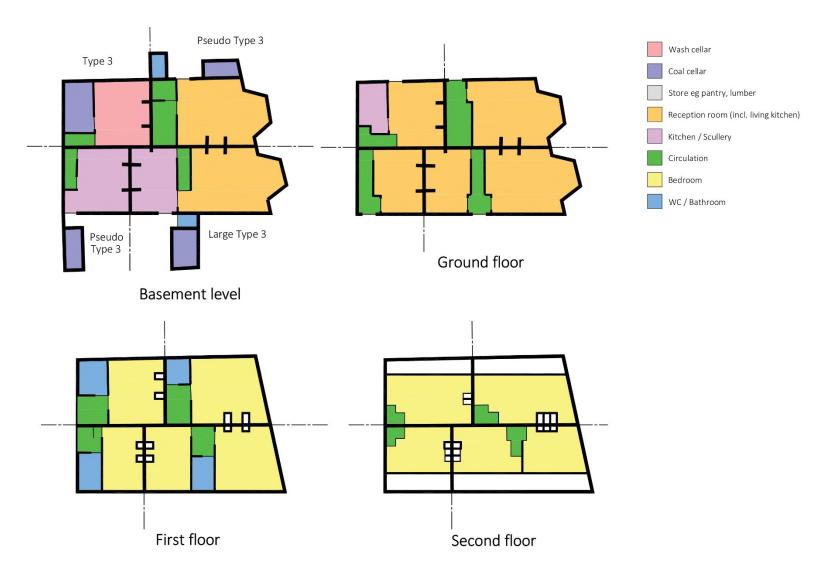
Multi plan-form configuration at the end of Bayswater Row and Bayswater Terrace facing Harehills Road. Large bay windows to the basement and ground floor rooms, express a status commensurate with their prominent position on a main road (Redrawn from original plans by Lax 1893a).
